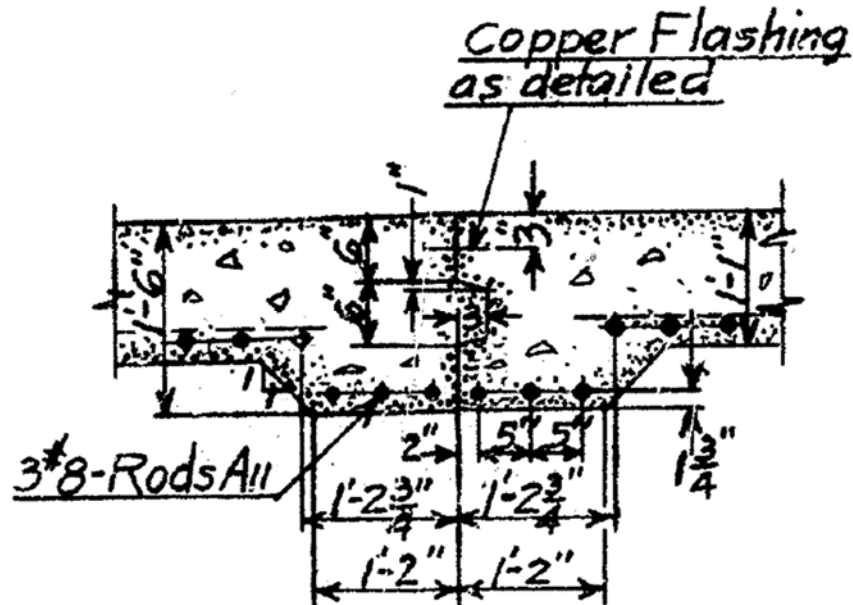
Structure 0118150 – Expansion Joint and Stiffening Ribs
